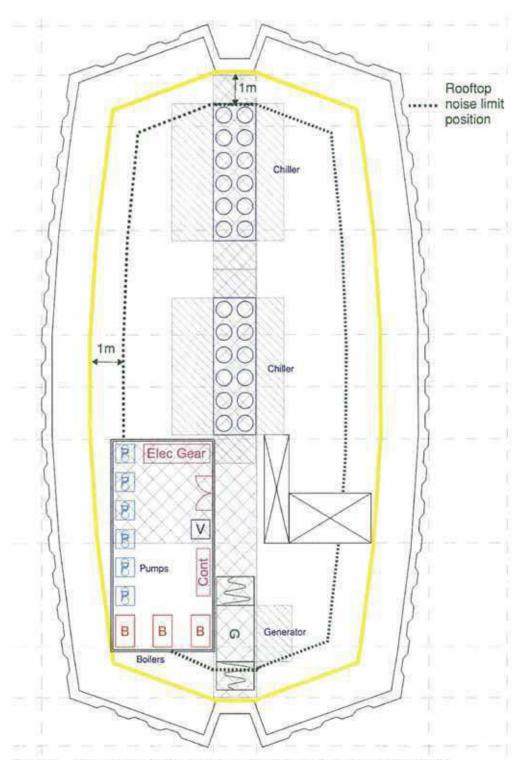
Plant layout indicating where the rooftop plant noise criteria apply
